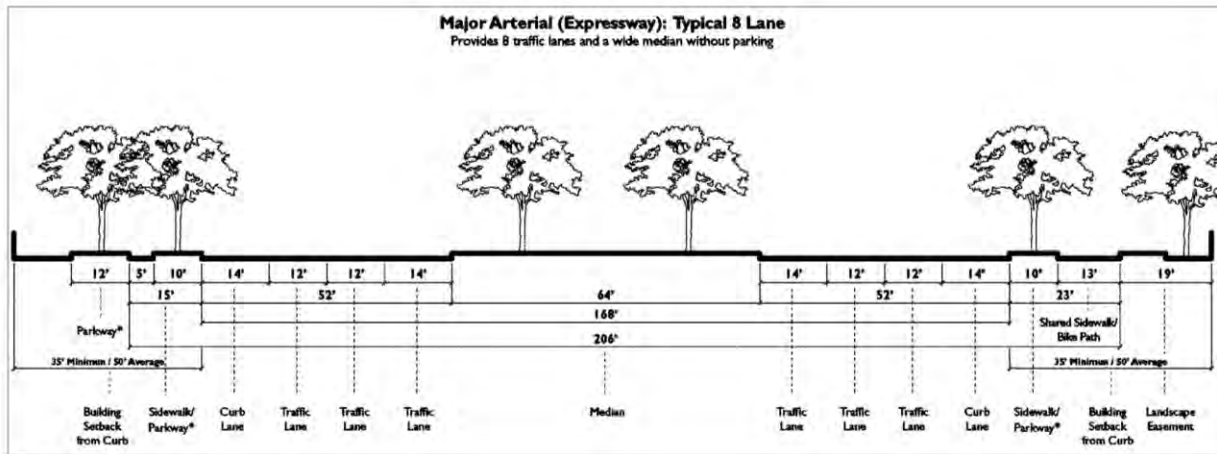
CITY OF CHINO GENERAL PLAN ROADWAY CROSS-SECTIONS (2 OF 3)
